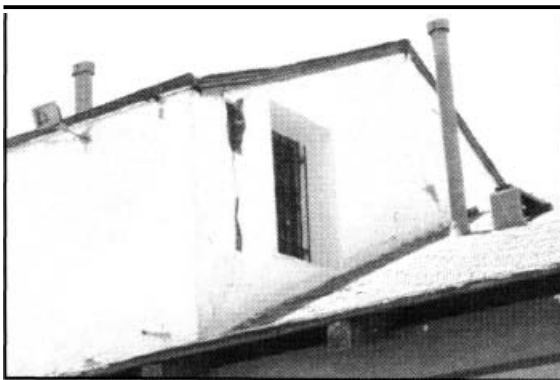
Vicente Sanchez Adobe. Cracking at the corner of the upstairs gabled wall.
